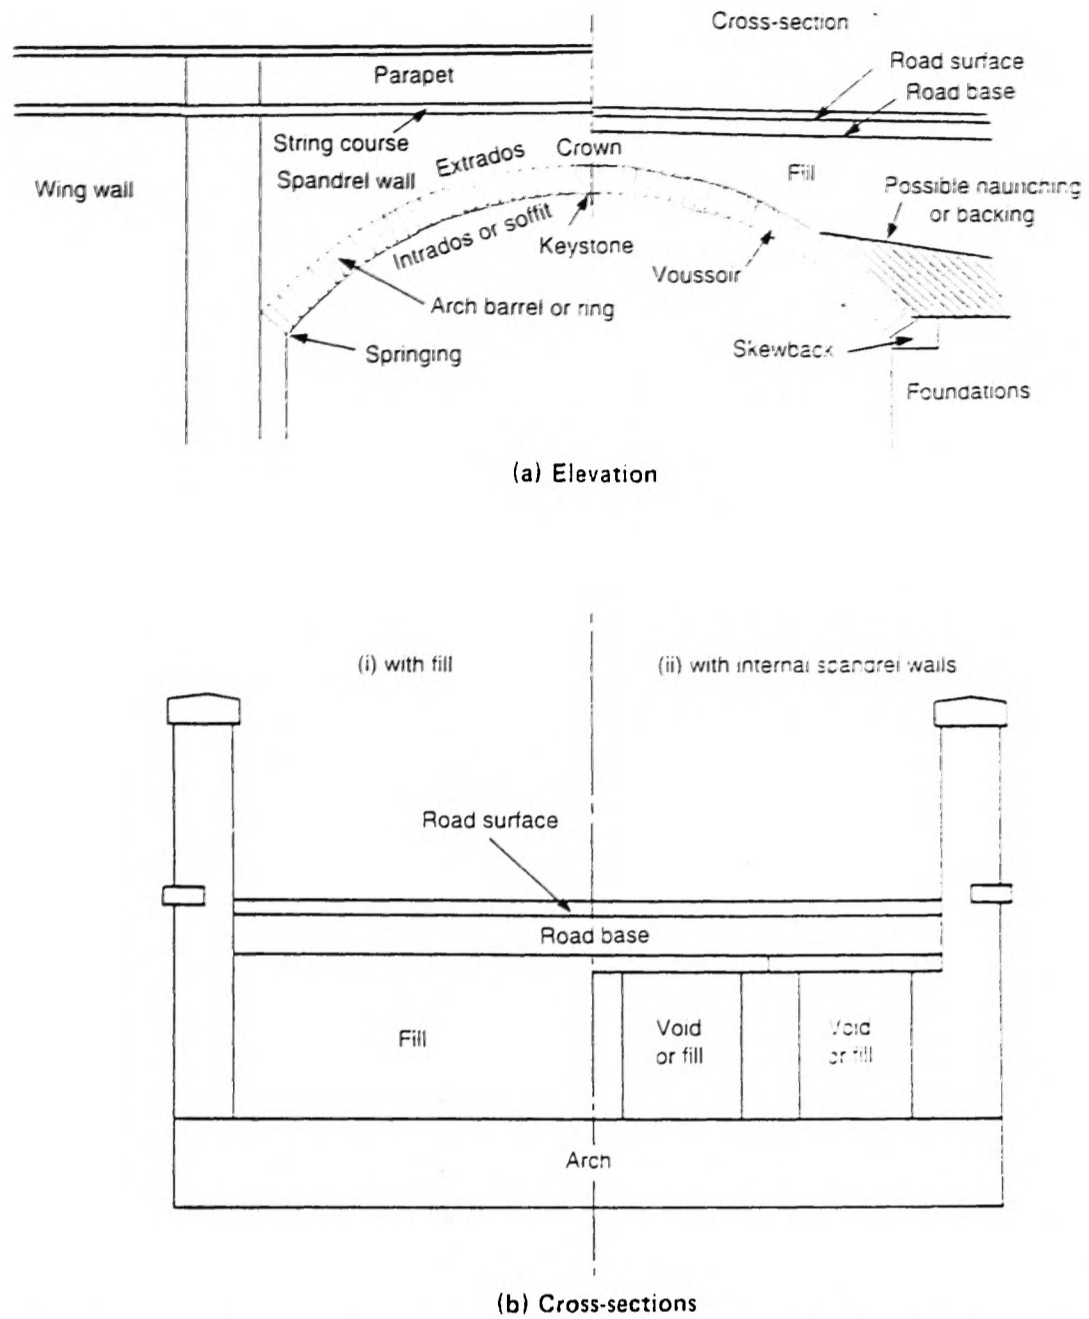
Typical masonry arch bridge elevation and sections (Page, 1993)
